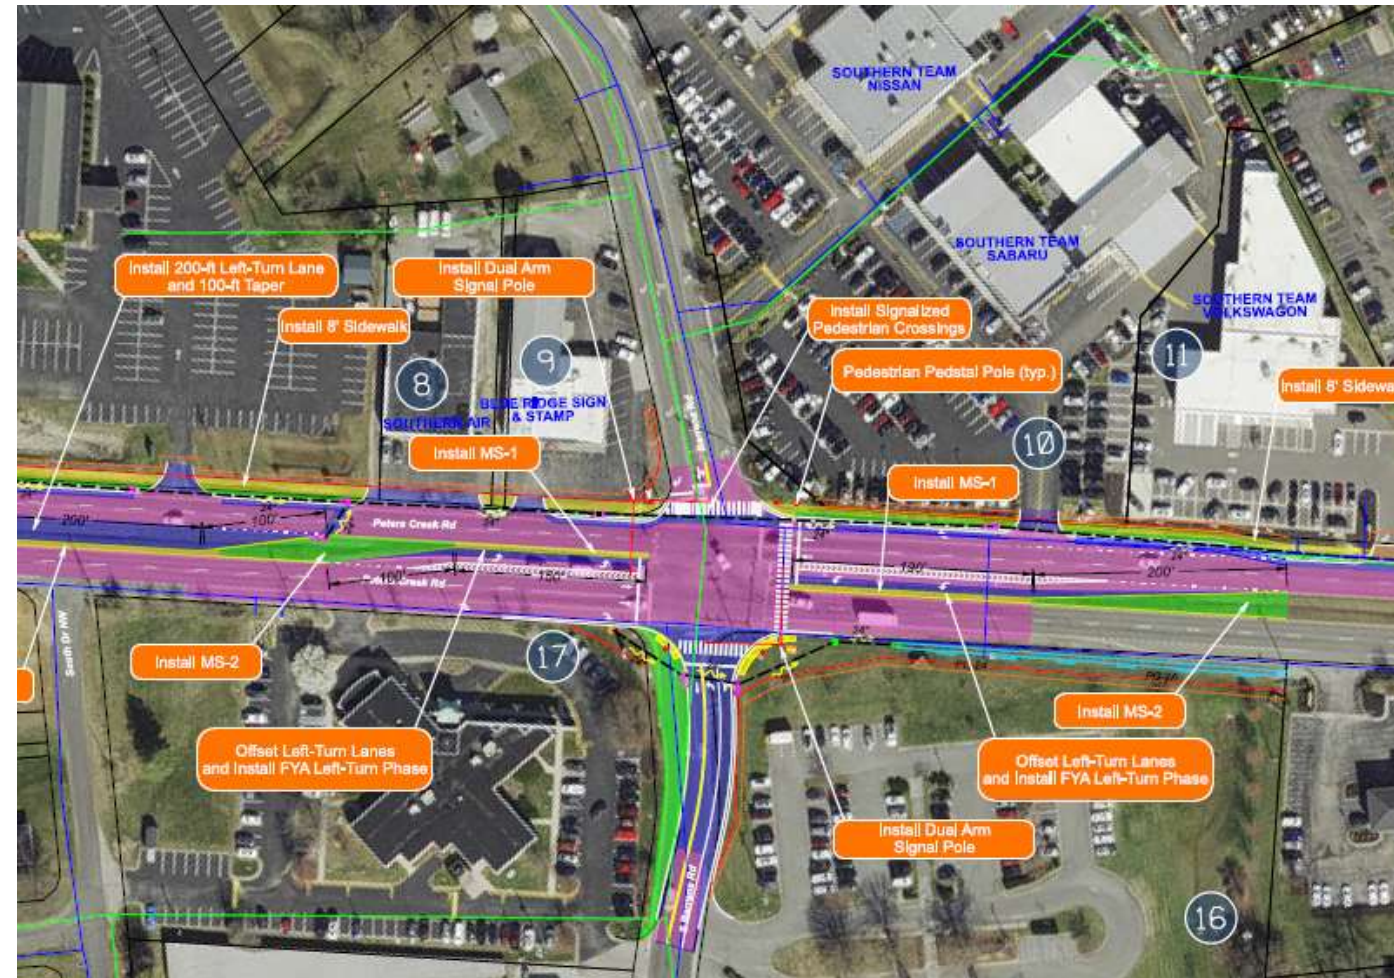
Peters Creek Road at Barrens Road Refined Concept
